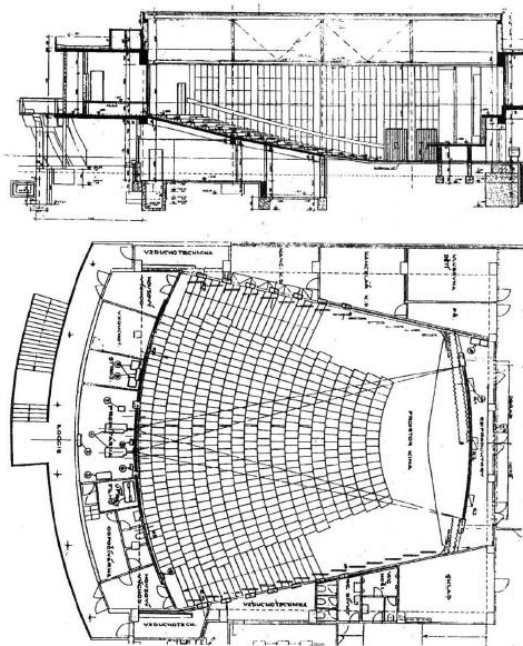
Kosmos Cinema – Floor plan and cross-section [26]
